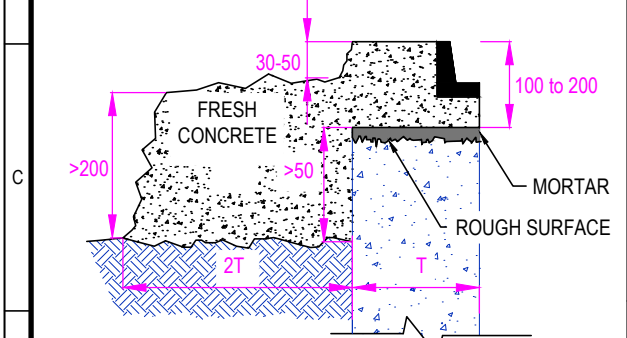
B: PLAIN CONCRETE CONSTRUCTION JOINT
